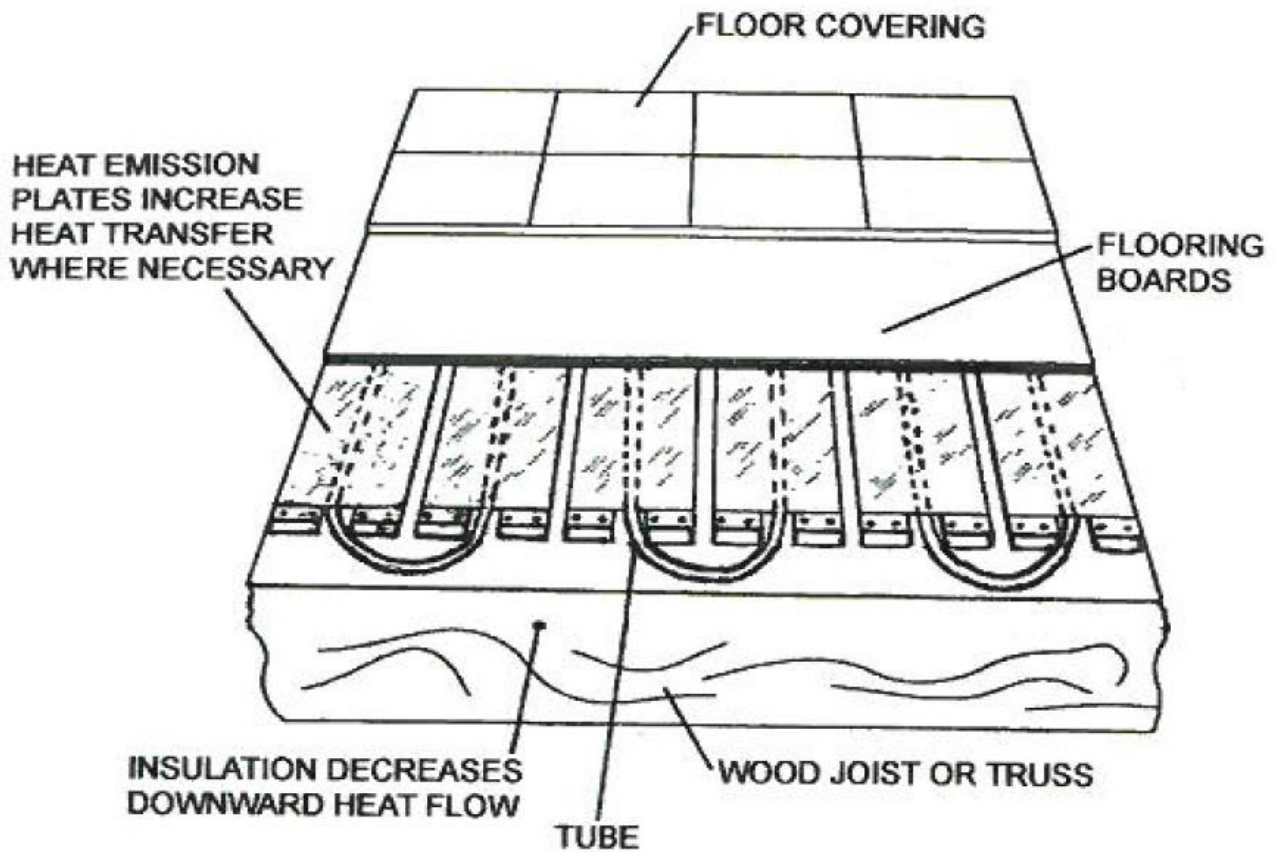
Type G under floor heating system with pipe embedded in wooden floor.
